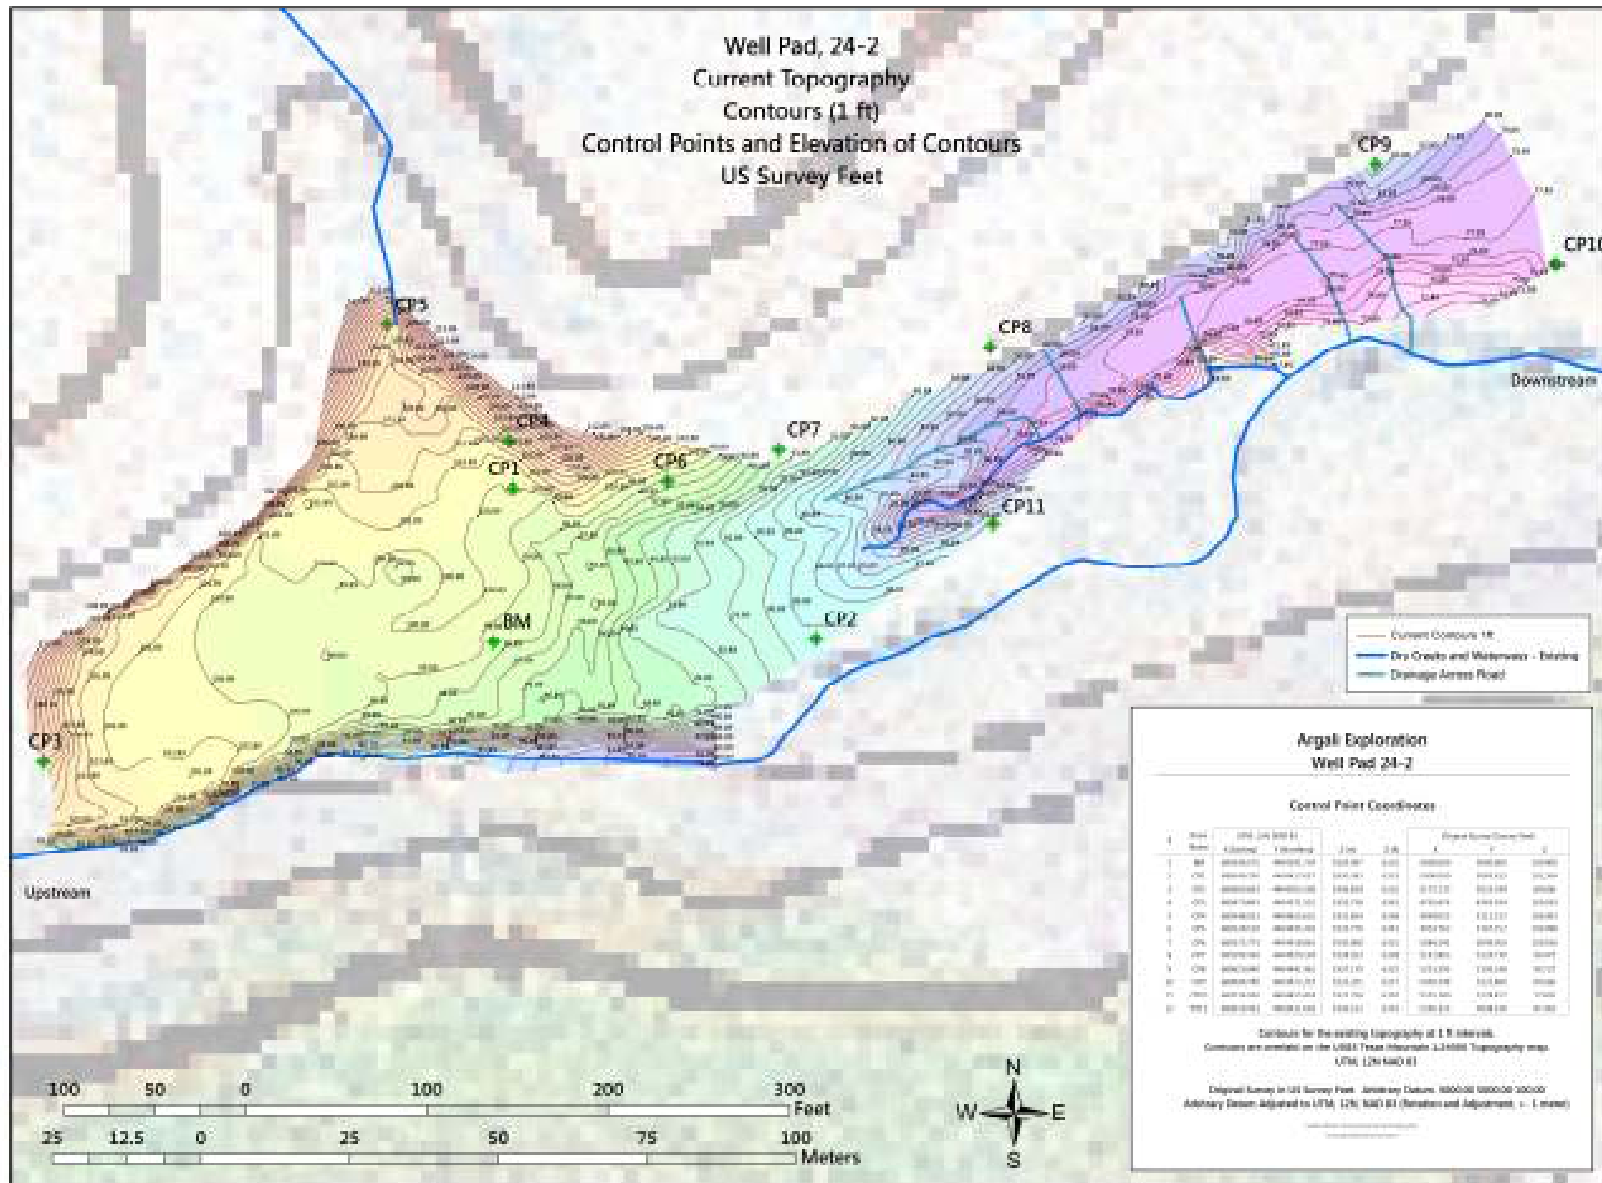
Overview of control points, current topography with elevations in feet, and drainages.
